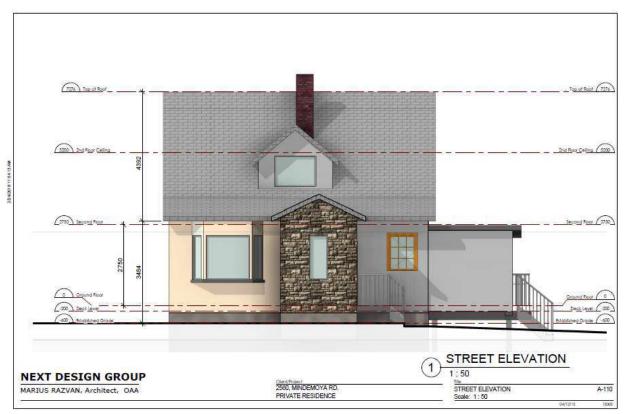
Front elevation of existing structure at 2560 Mindemoya Road. (Image from Next Design Group, February 2018.)
